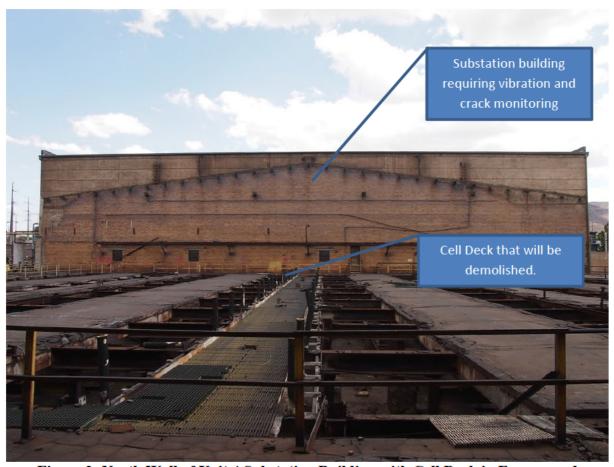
North Wall of Unit 4 Substation Building with Cell Deck in Foreground
